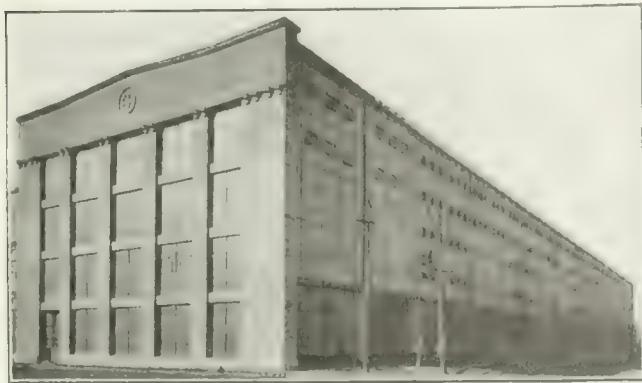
MACHINE SHOP WITH GLASS WALL 604 x 239 FT.
